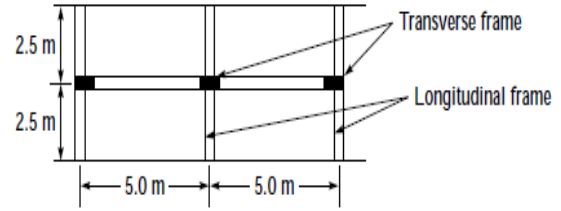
Plan showing the column and beams at floor levels of the plane frame
